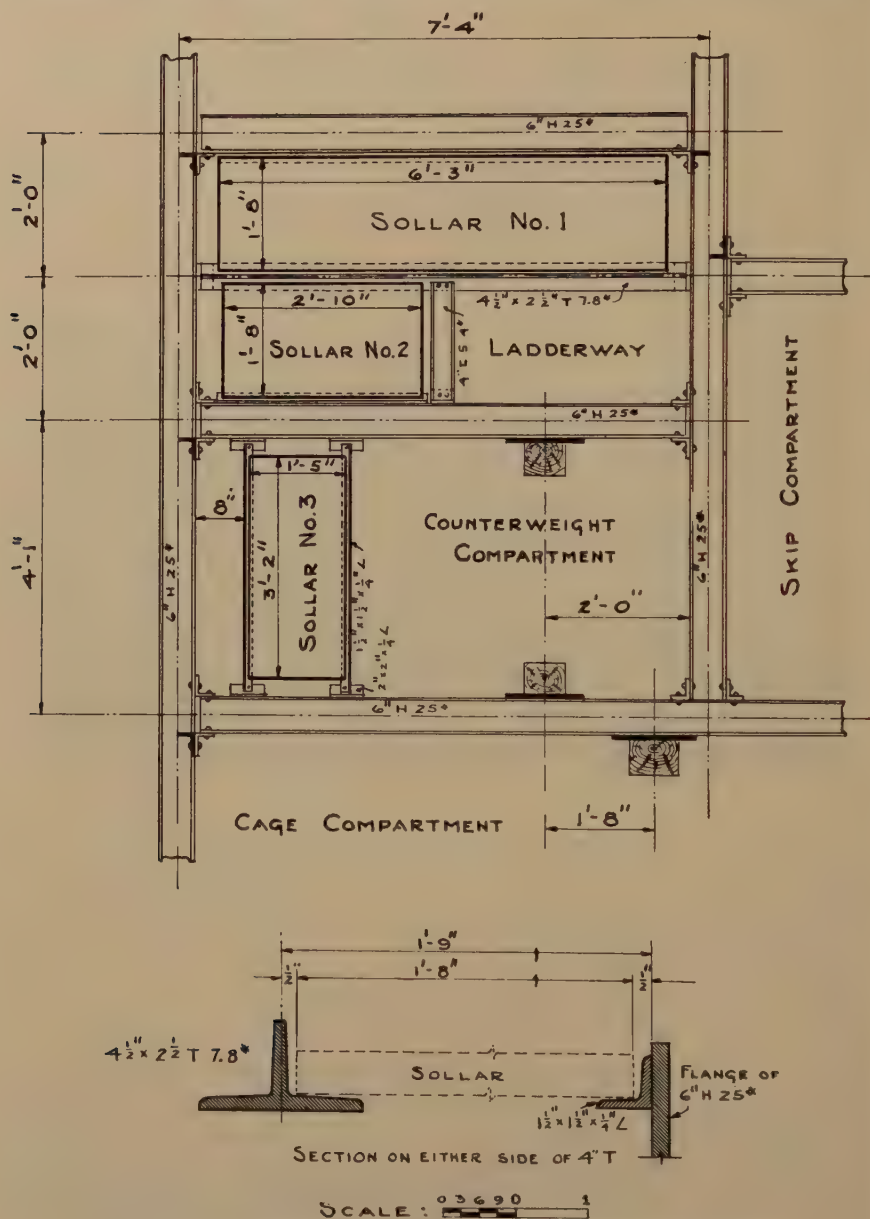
PLAN SHOWING POSITION OF SOLLARS AND THEIR SUPPORTS.
